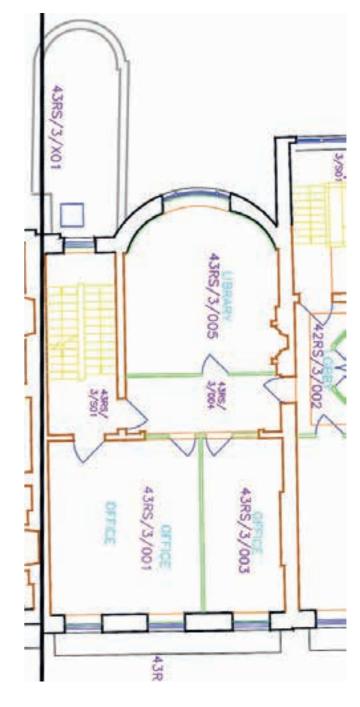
Existing first floor plan, showing link to adjacent property at no. 42
